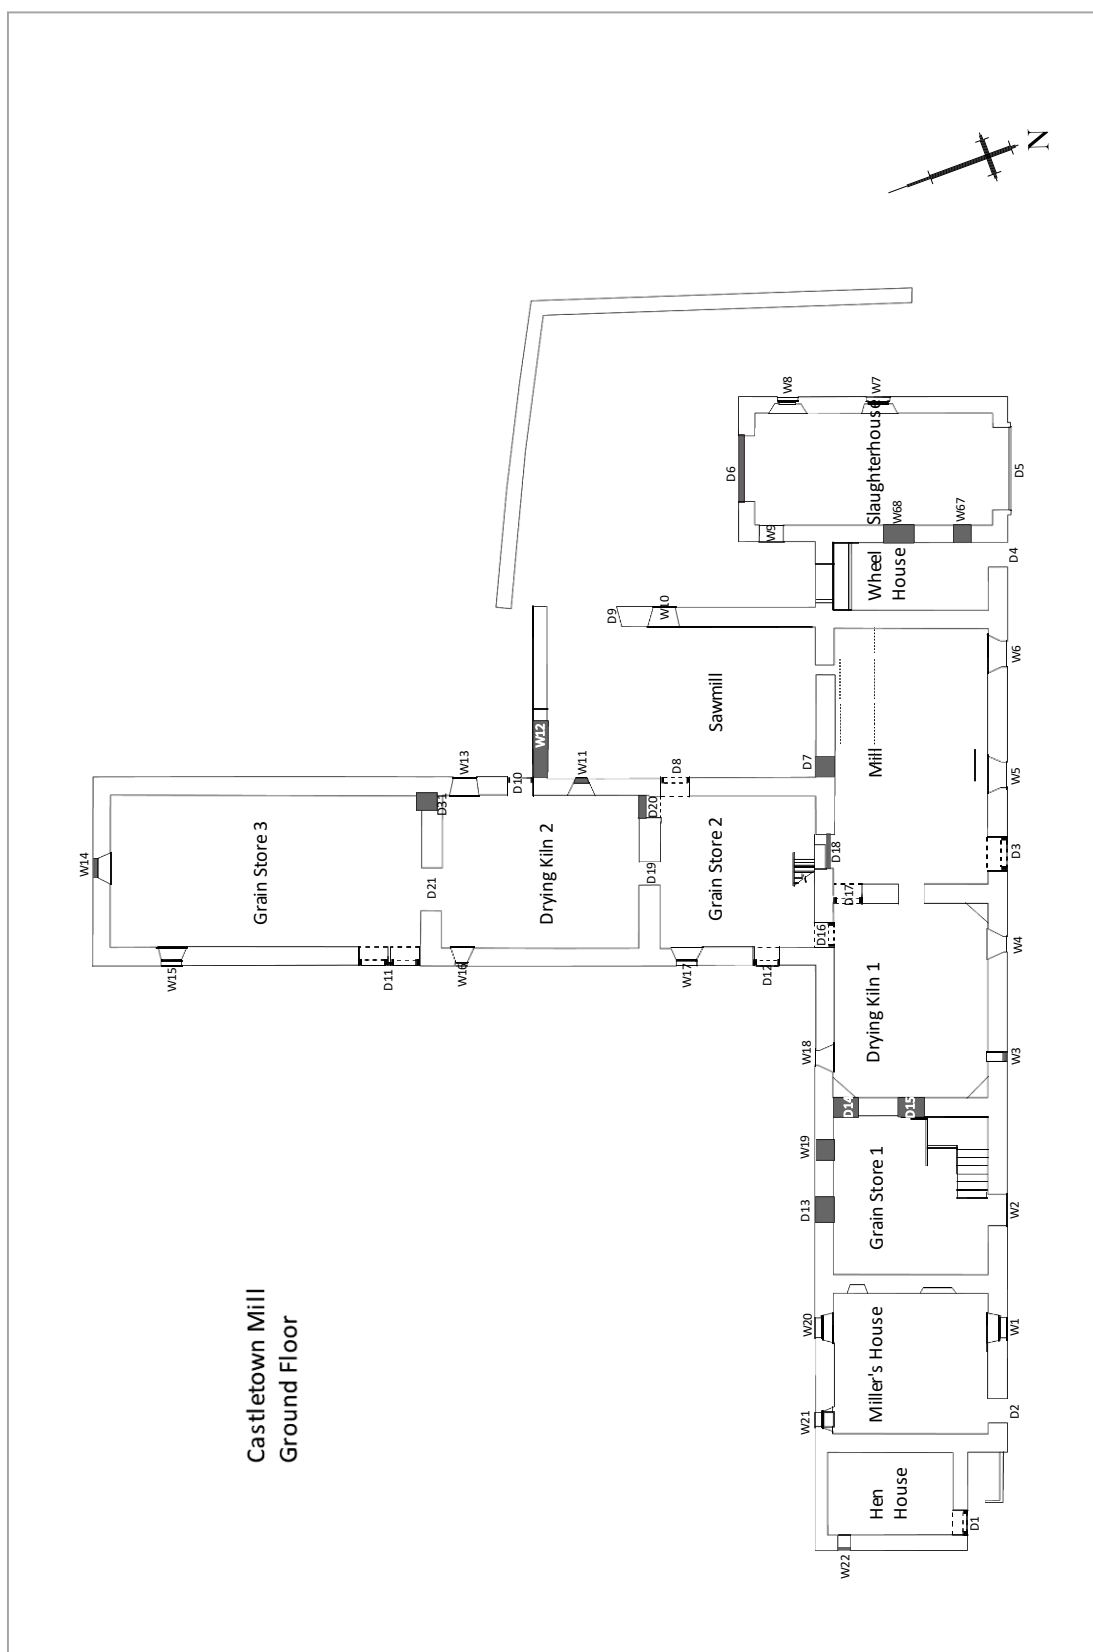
Ground Floor Room Plan of Castletown Mill (Including doors and windows)
